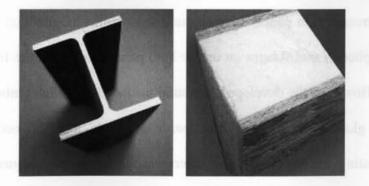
Similarities between Structural Insulated Panel and I-Beam Cross-section
